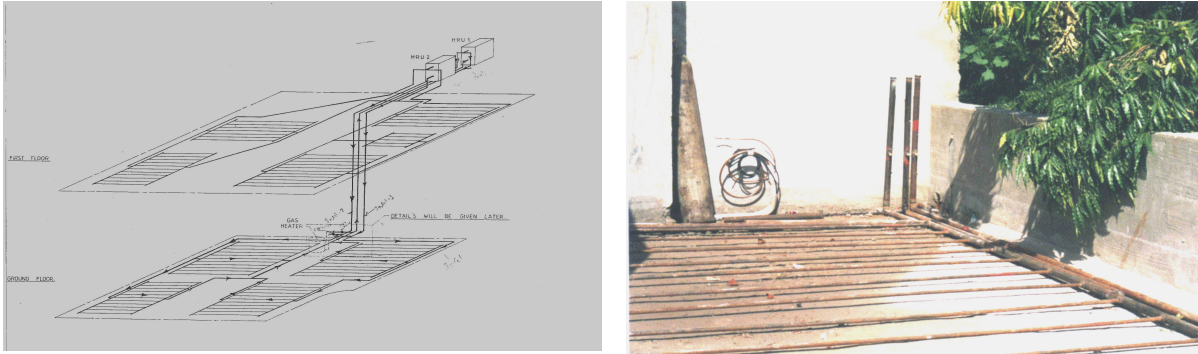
Building Structure Cooling: Grid of Pipes on the Roof and Floor
